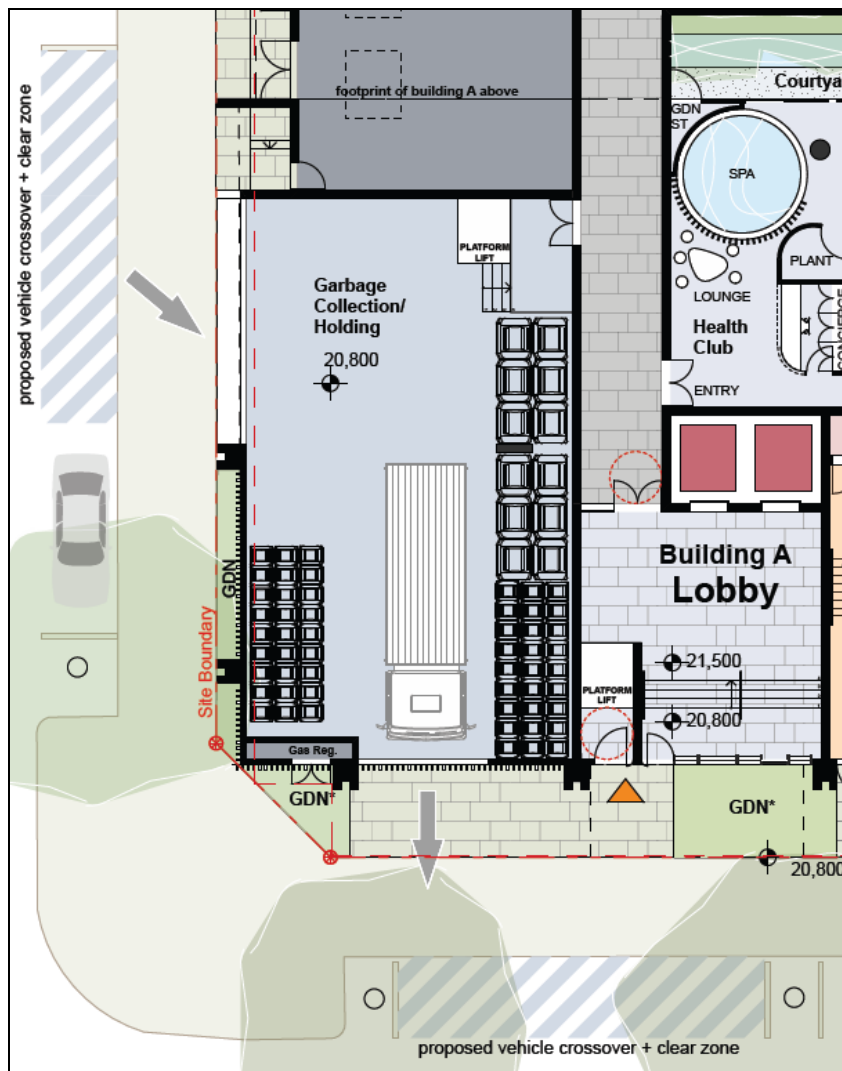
The proposed garbage storage and collection room and vehicular egress requirements from Kirby Walk and George Julius Avenue.
